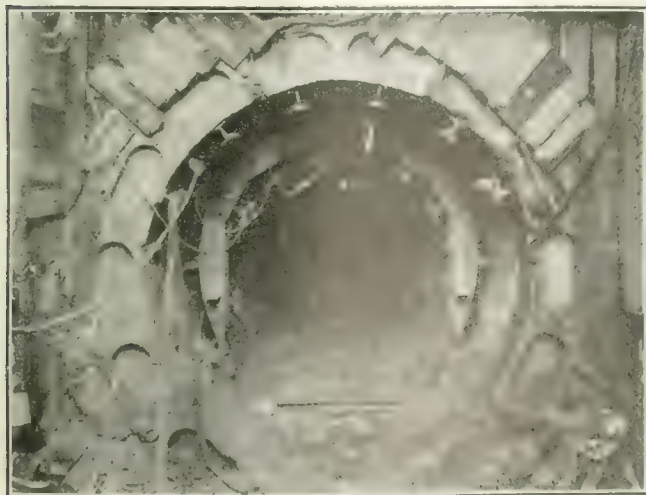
TRAVELING PLATFORM, FRONT VIEW AFTER REMOVAL OF SHIELD AT TERMINAL SHAFT
